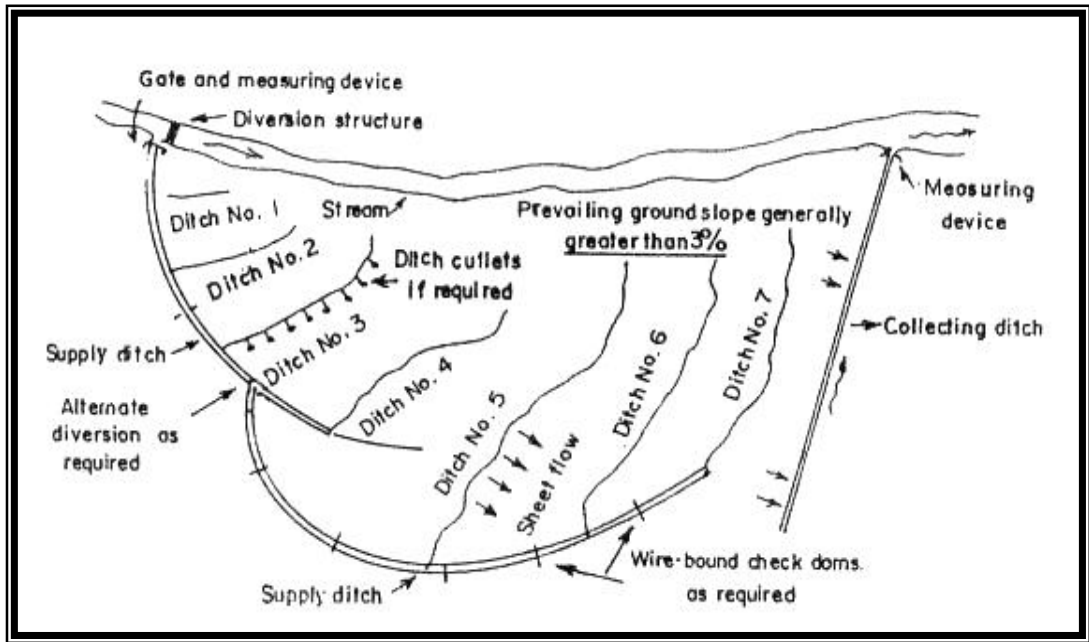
(a) Schematics of a Typical Ditch and Furrows Recharge System
